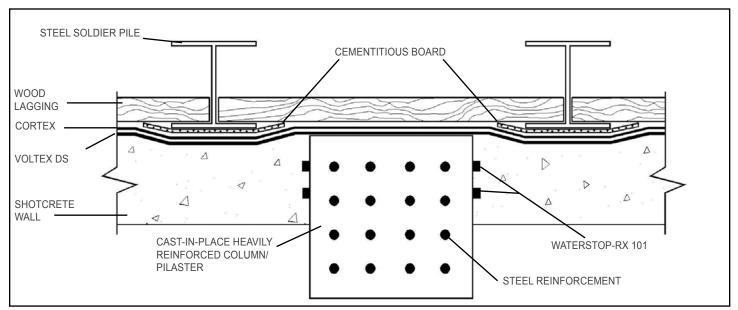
CAST-IN-PLACE STRUCTURAL COLUMNS AND PILASTERS
